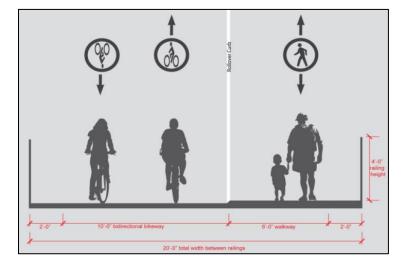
Recommended Cross-Section for Separated Pedestrian and Cyclist Facility
